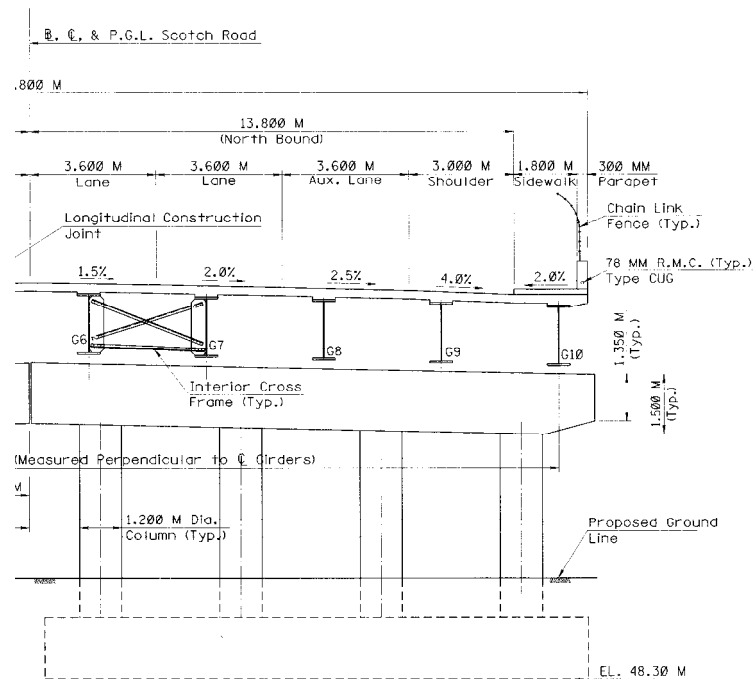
Scotch Road Bridge – Interior Pier Elevation (Courtesy of NJDOT)
